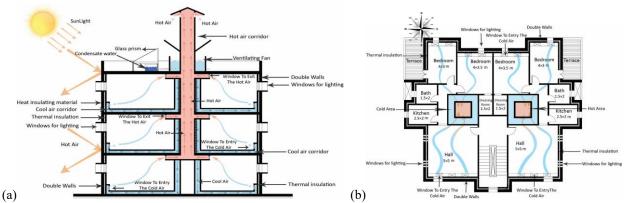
The architectural application of the proposed strategy; (a) section and (b) typical floor plan Source: (Shahda et al., 2018)
